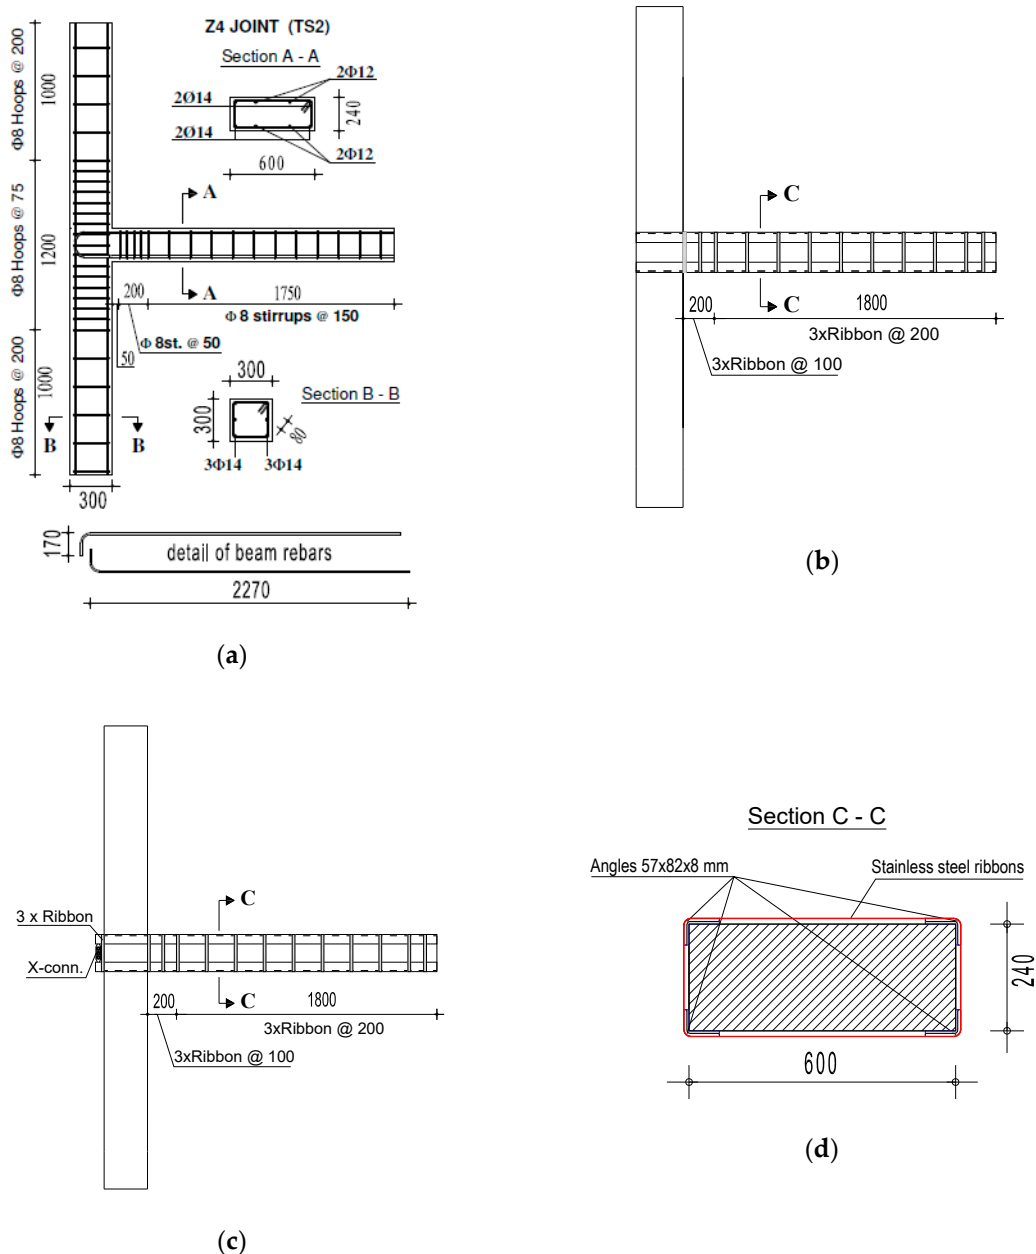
(a) Detailing of tested (Z4) as-built joint specimen TS2, (b) strengthening solution for TS9 specimen, (c) strengthening solution for TS10 specimen, (d) cross section view of the beam in strengthened specimens.
